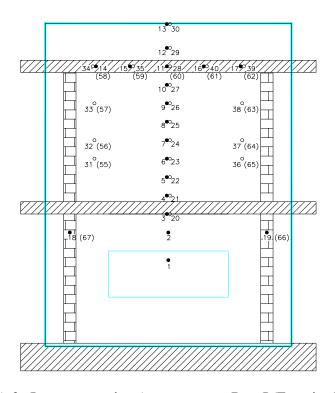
Instrumentation Arrangement--Part I (Exterior Face).
